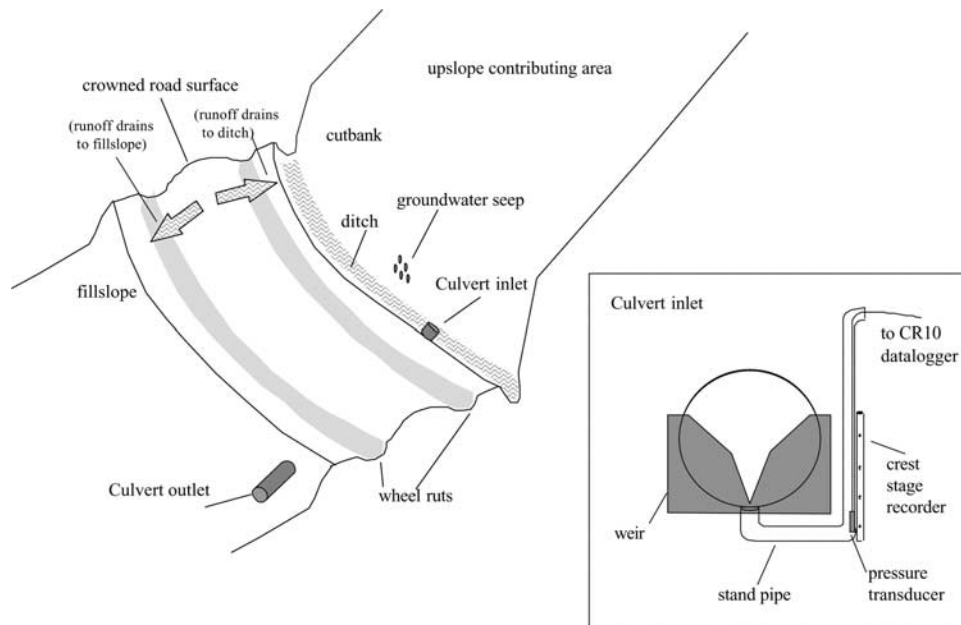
Schematic representation of cut-and-fill forest road, showing drainage area contributing to a road segment. Inset illustrates gaging system installed at culvert inlets for this study.
